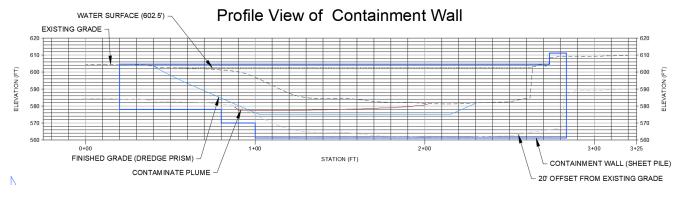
Typical Profile View of a Sheet Pile Containment Wall
